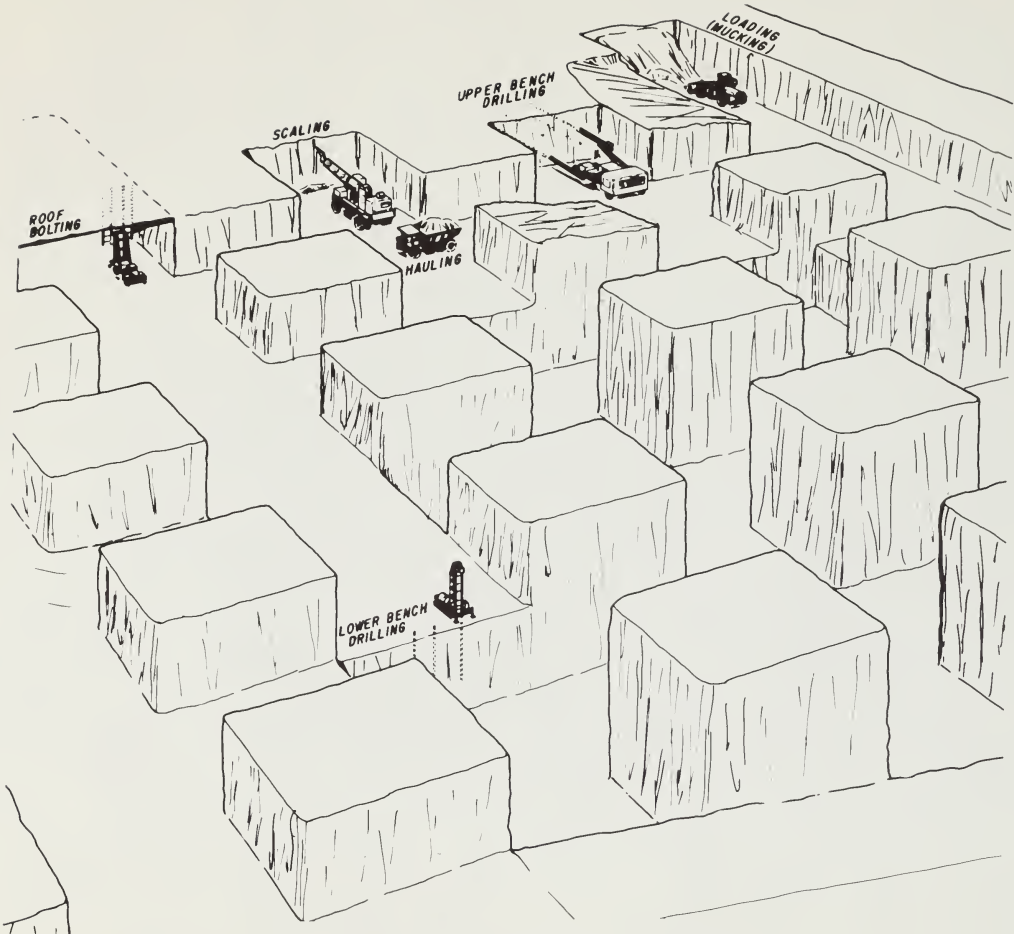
ROOM-AND-PILLAR MINING CONCEPT
